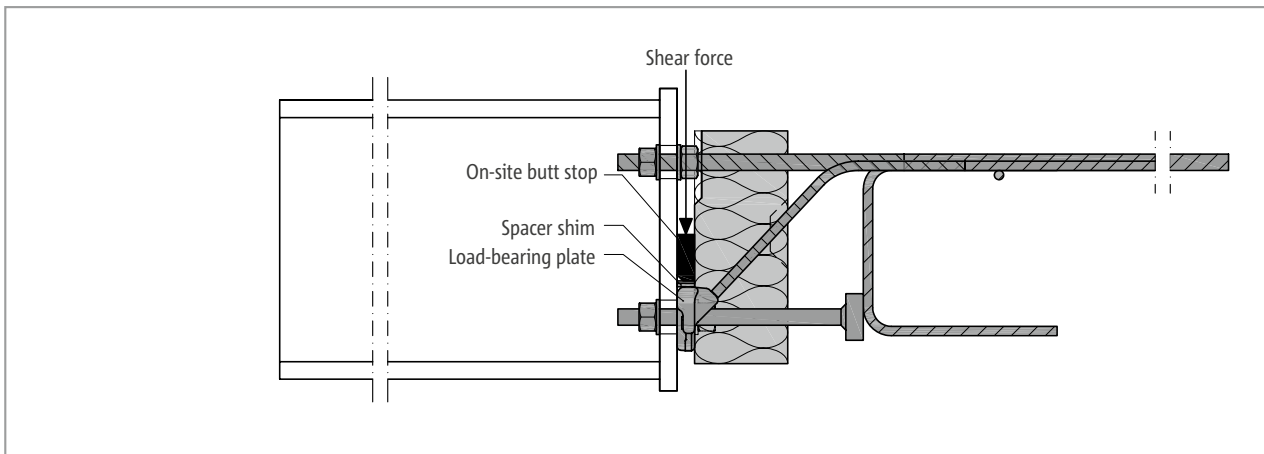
Schöck Isokorb® T type SK: On-site butt stop for transferring shear forces
